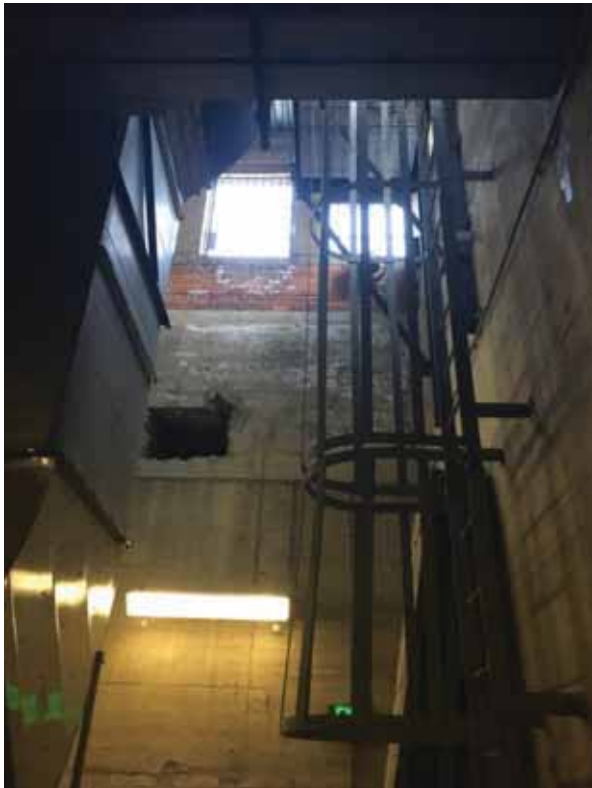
Roofed areaway (former ice storage tower) from sub-basement to rear parking area
